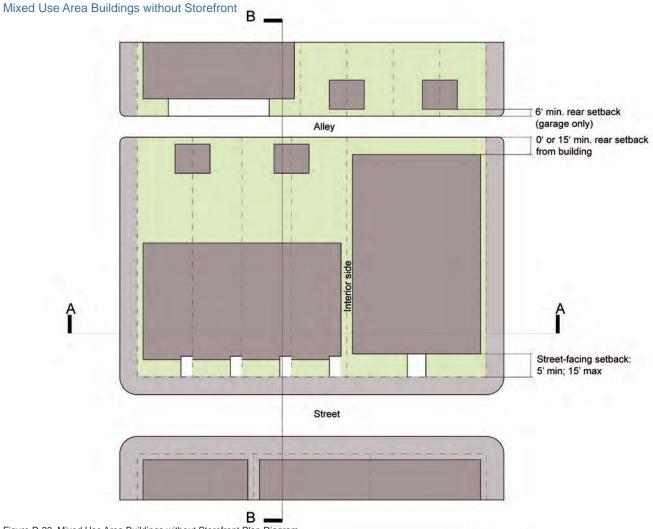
Mixed Use Area Buildings without Storefront Plan Diagram
